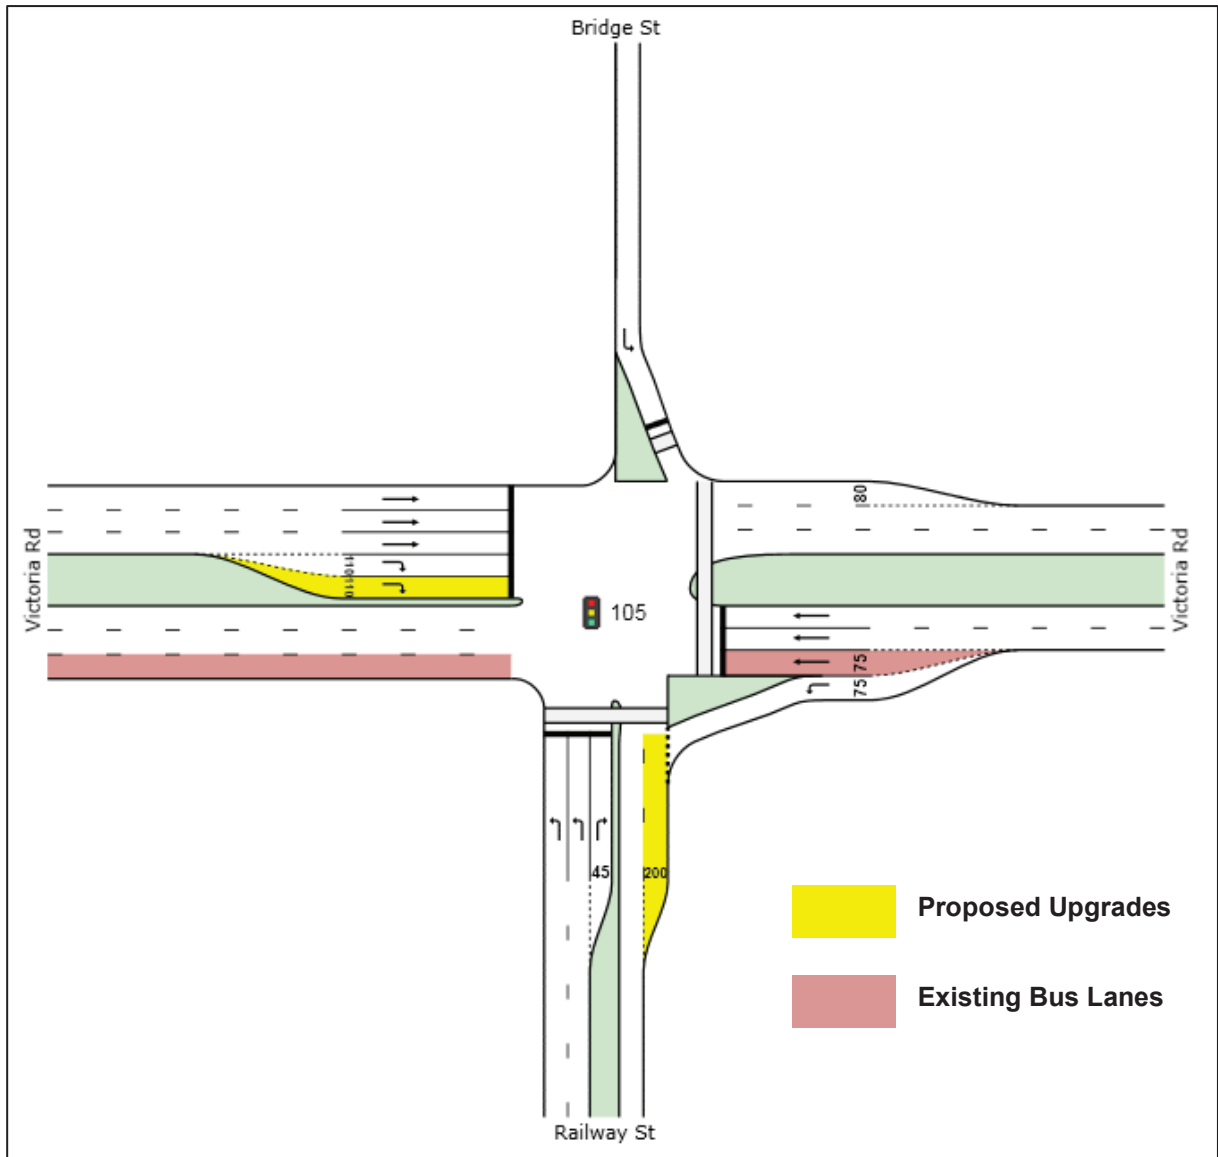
Victoria Rd / Railway St / Bridge St - Indicative Upgrade Layout
